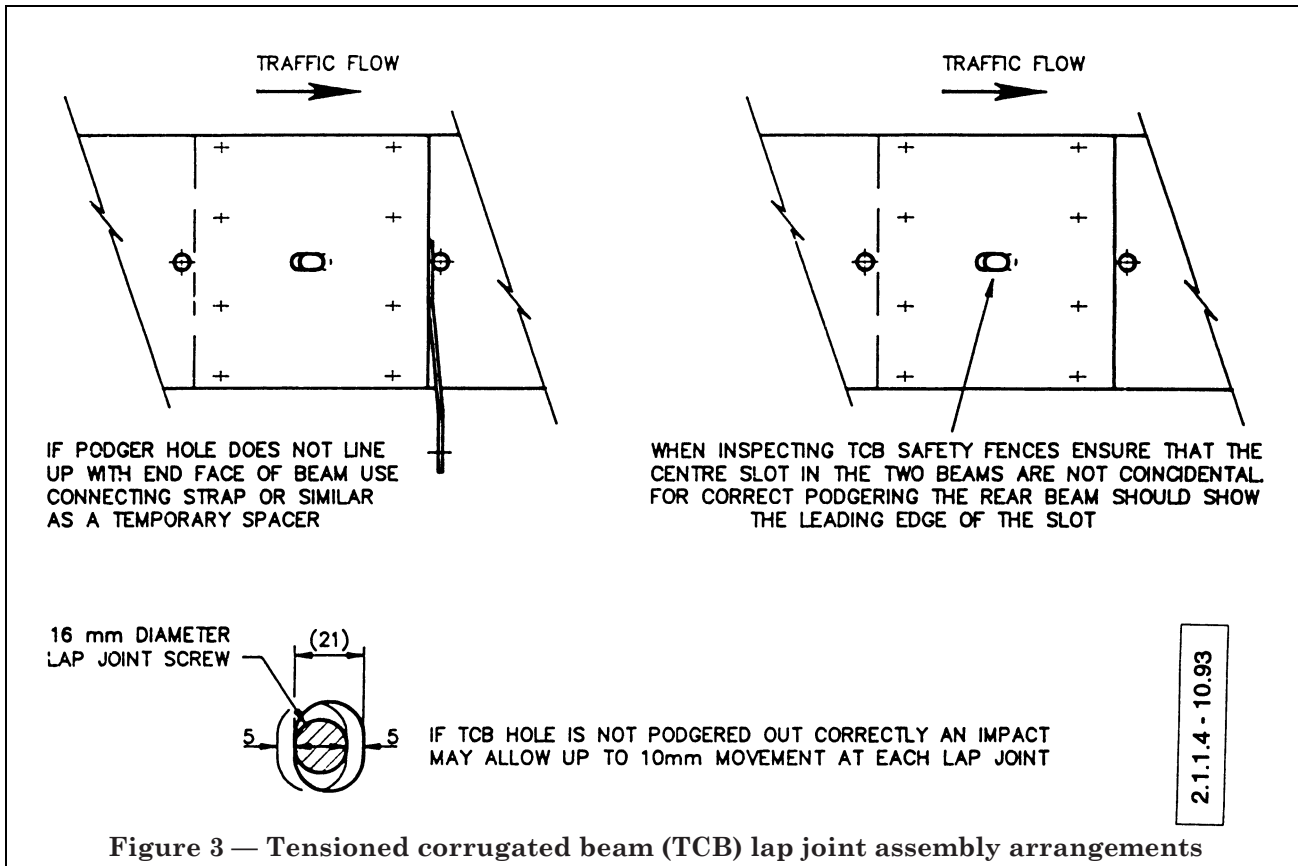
Tensioned corrugated beam (TCB) lap joint assembly arrangements
